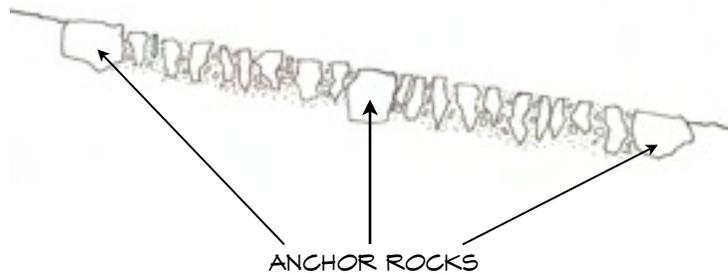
Longitudinal Cross-section of the "Stone Pitching" method of Tread Paving
